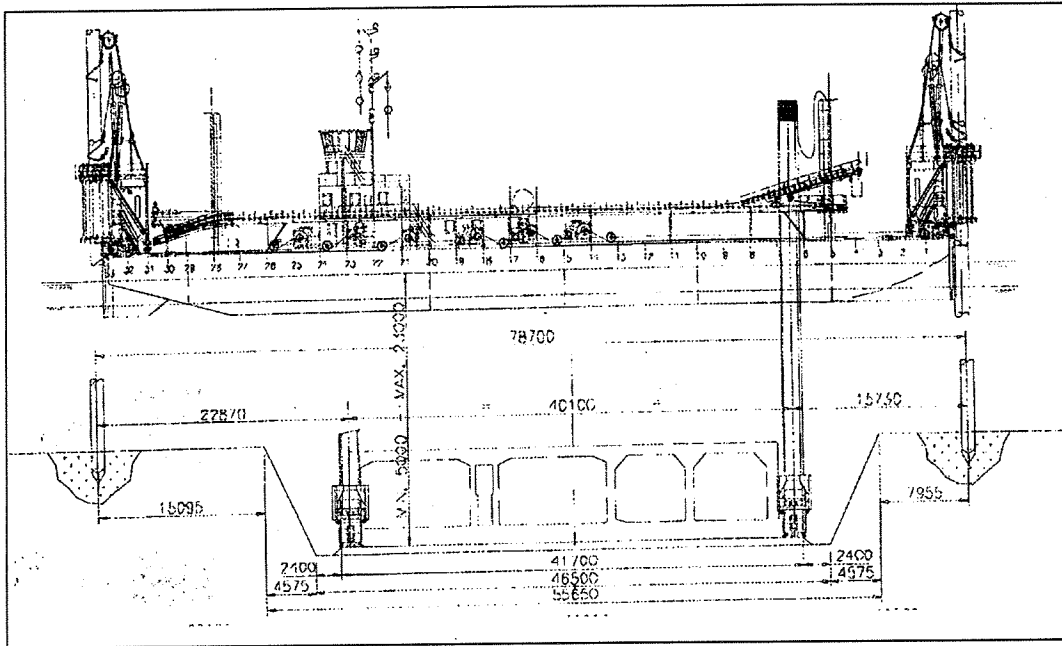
General plan of the Multi -Purpose Pontoon².
